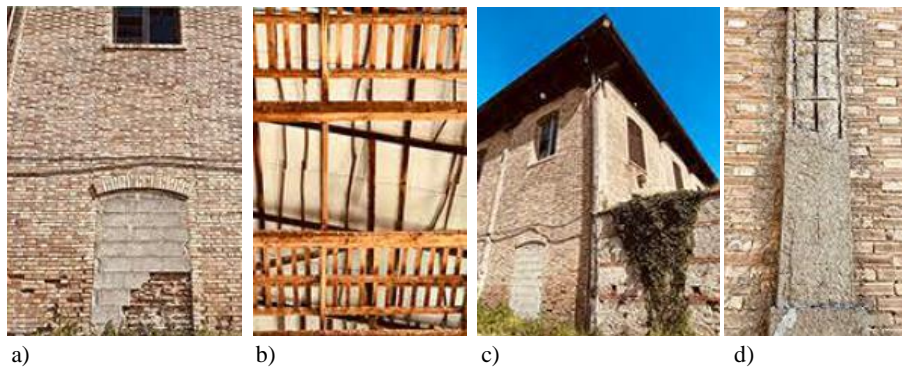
Injuries on the case study: a) Crushing of masonry walls, b) Poor connection between adjacent walls, c) Decay of wooden beams, d) Detachment of the cover concrete from the pillars
